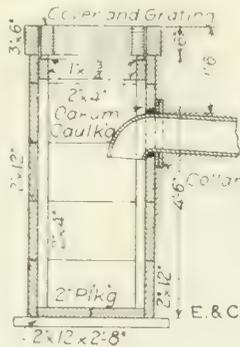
Section of Wooden Catch Basin, Panama-Pacific Exposition, Sewerage System.
